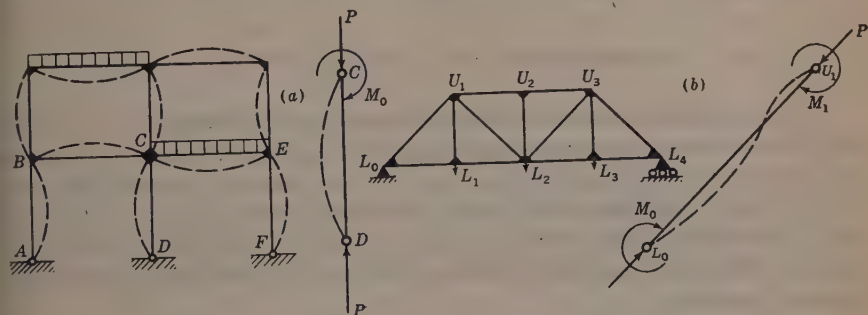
THE COLUMN IN RIGID FRAME CONSTRUCTION.
